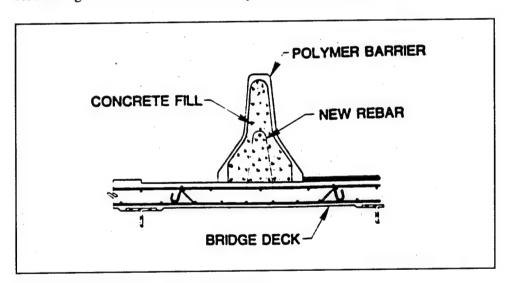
Cross section of precast concrete shell median barrier on Pennsylvania Turnpike (from Barnaby and Dikeou 1984)
